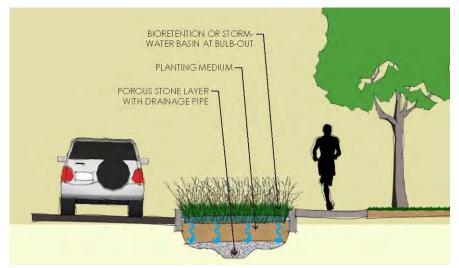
Typical Green Street Bioretention Bulb-out
